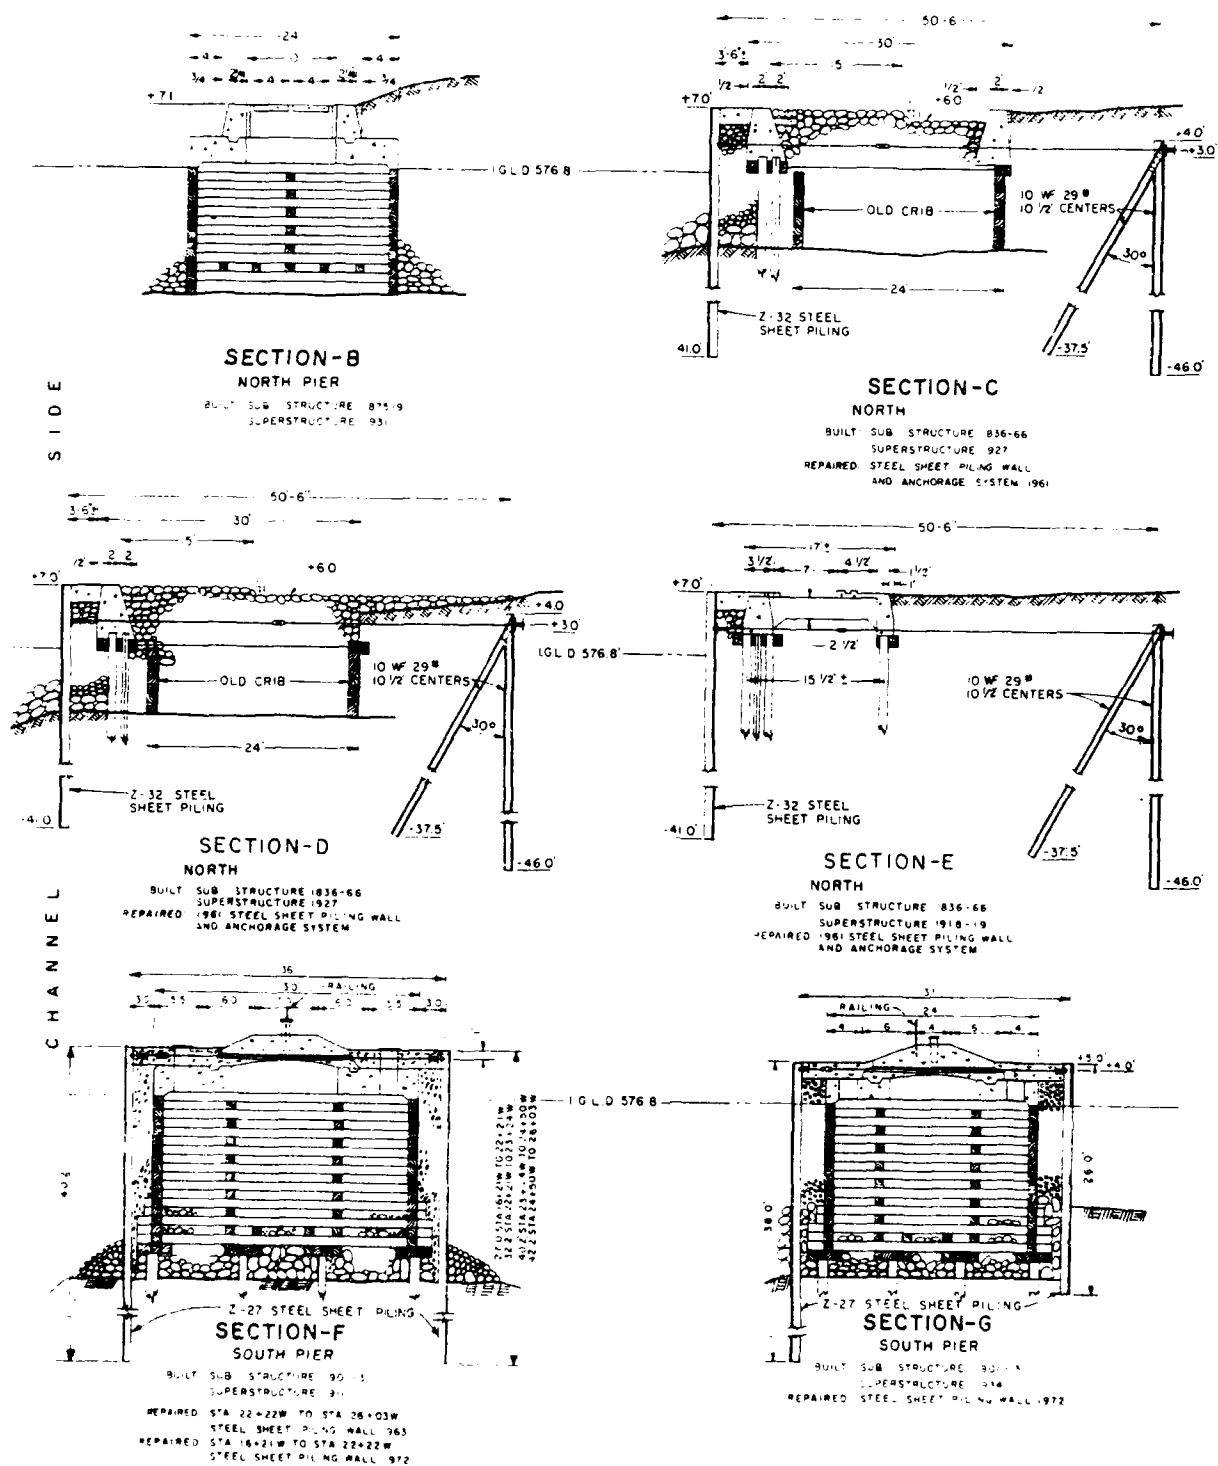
Typical pier cross sections, Saint Joseph Harbor, Michigan
